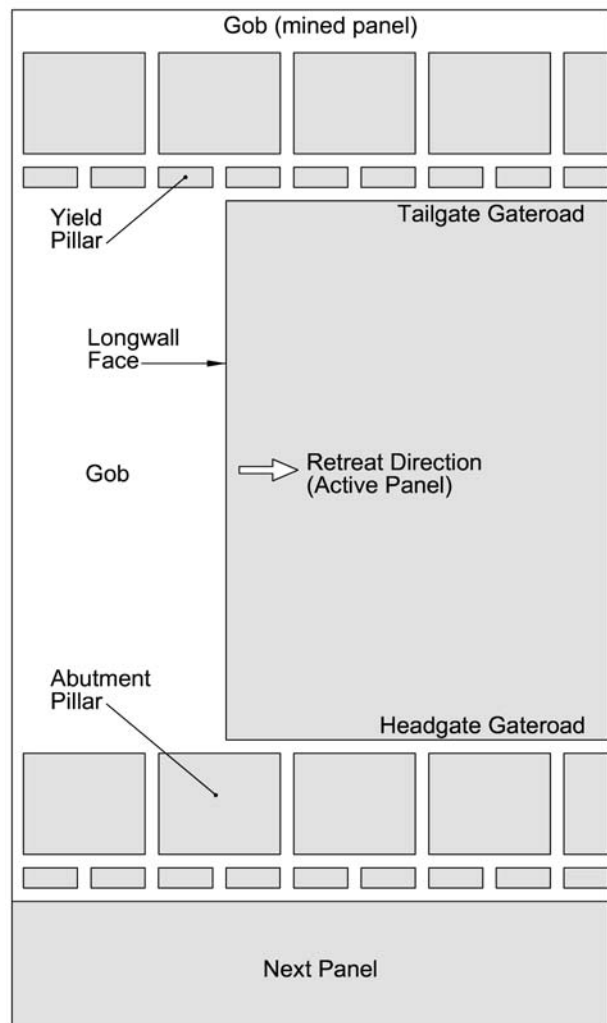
Plan of Three-entry Yield-abutment Pillar Gateroad System with Side-by-side Longwall Panels
